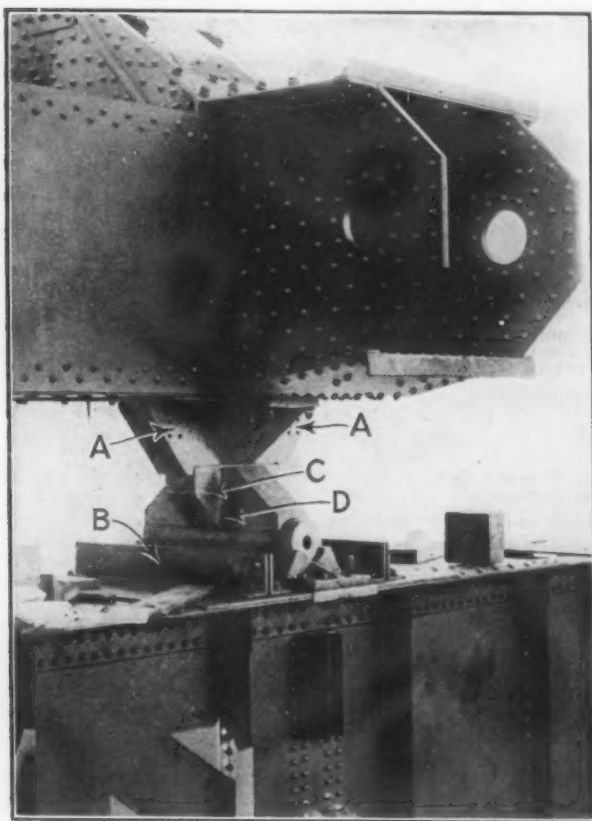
Rocker Joint Bearing Transmitting Load of Span to Lifting Girder
